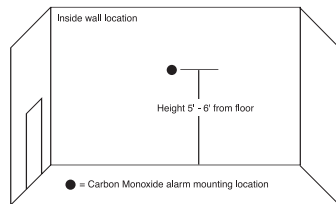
Recommended CO alarm wall mounting location is 5 to 6 feet from floor
